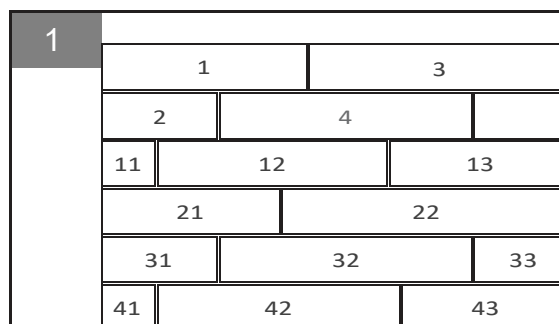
Planks should be staggered in a brick like pattern, with at least 8" (or 25% of the length of the plank) between end joint of adjacent planks. No plank less than 6" should be installed.
